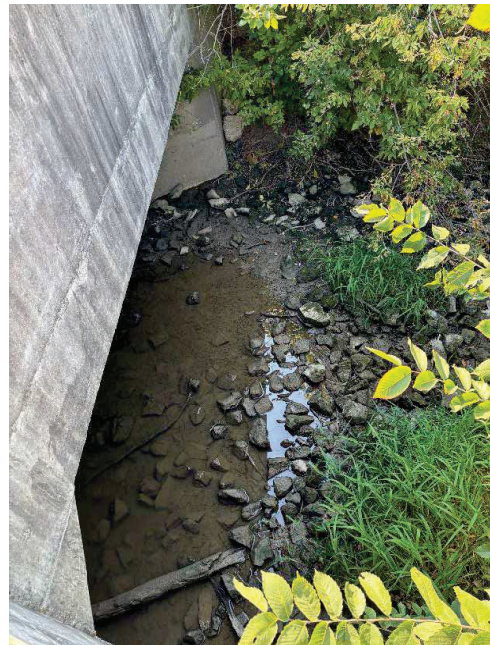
Outlet of Crossing 9, north side of County Road 46, facing west.
